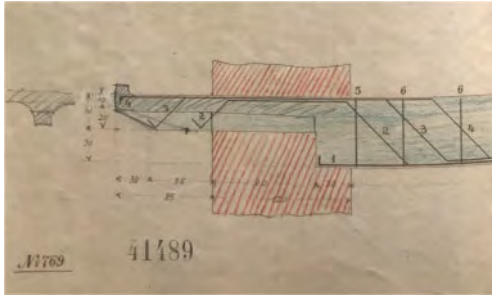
Detail of the slab in front of the cantilevering slab in front of the patients' rooms (source: Davoser Ingenieure AG DIAG).
